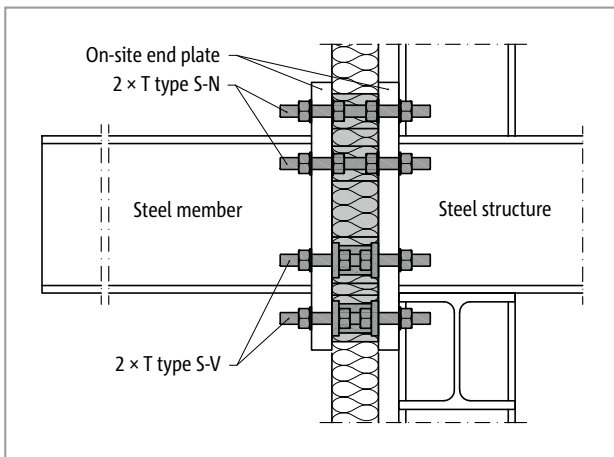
Schöck Isokorb® T type S for cantilevered steel structures
